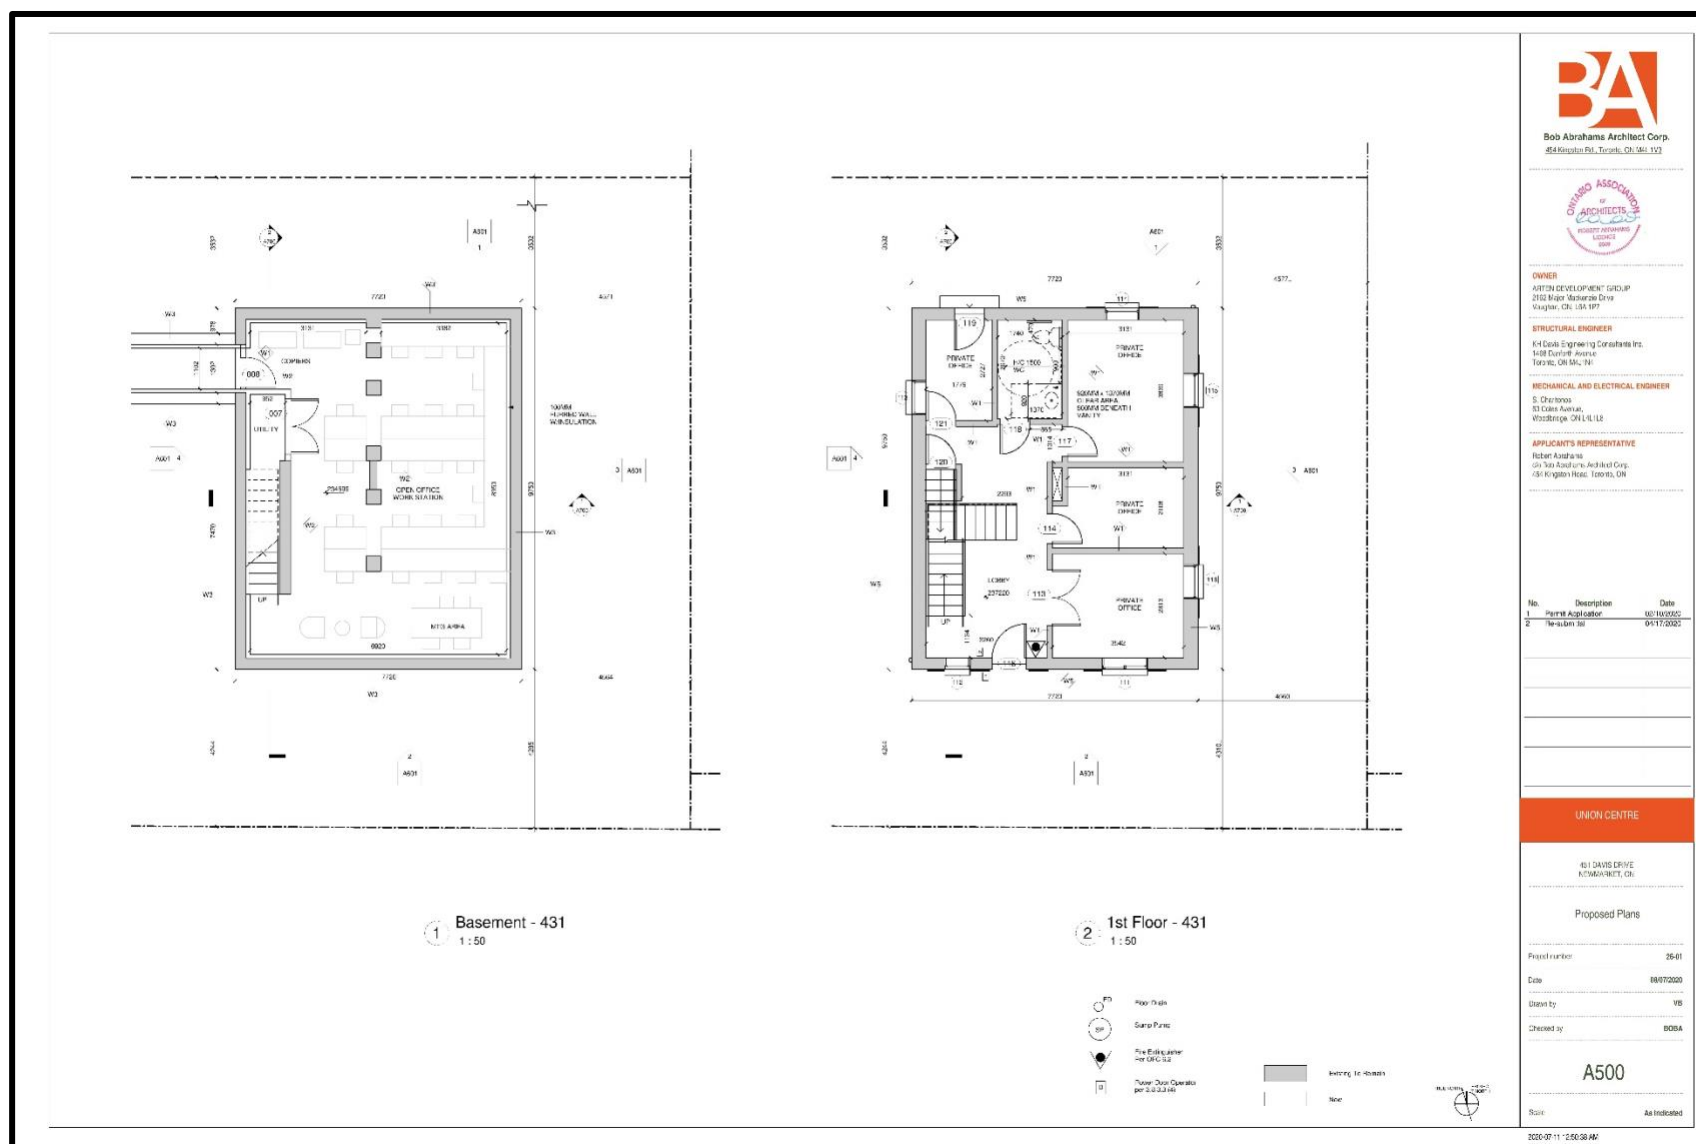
Proposed Basement and 1st Floor Layout for 431 Davis Drive
